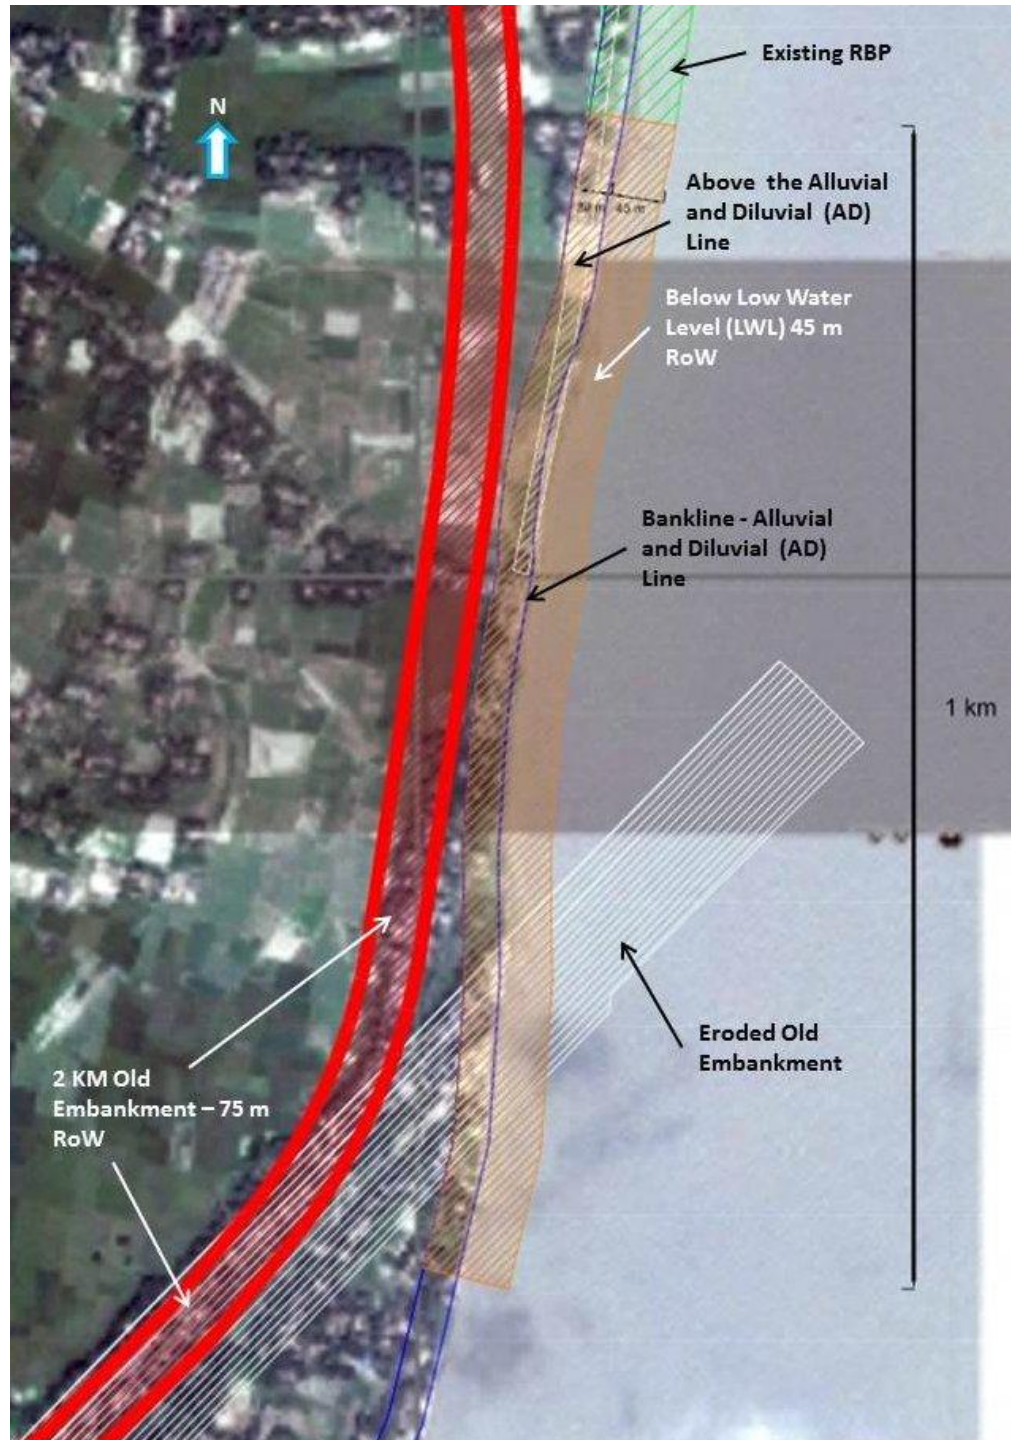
Proposed 1 Km New Jamuna Riverbank Protection (RBP)
